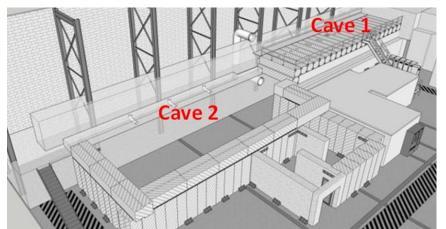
UITF layout shown with entrance labyrinth and Cave 2 roof removed.
